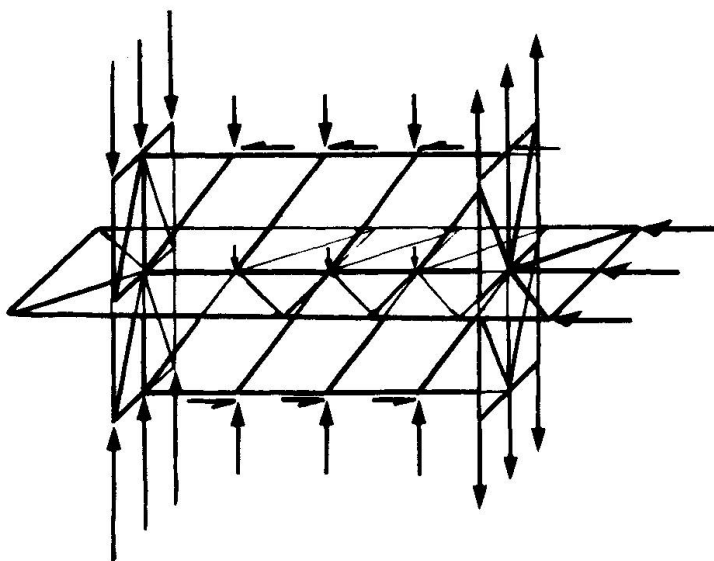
Truss Models for Floor Slab and Flanged Shear Wall
